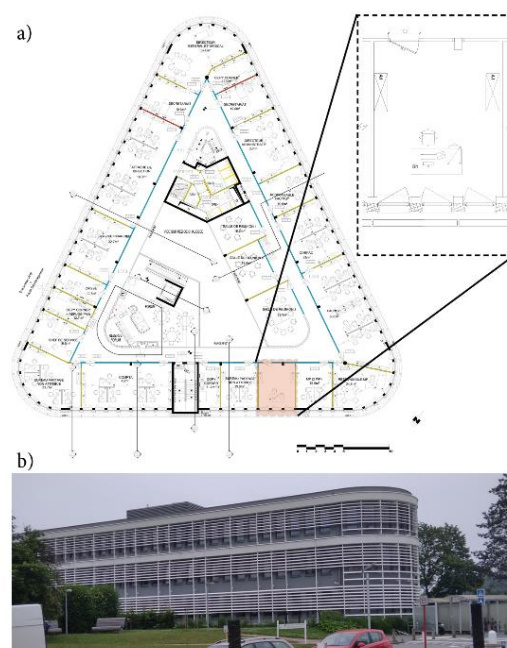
Case study building; a) First-floor plan of Clinique Saint-Pierre building with highlighted selected office; b) Perspective view of the building.
